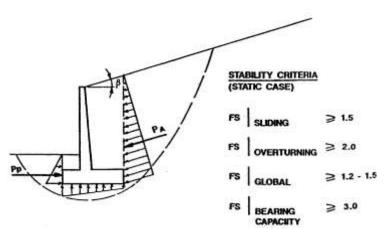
Different wall stability criteria (static case) (Abramson et al.)
